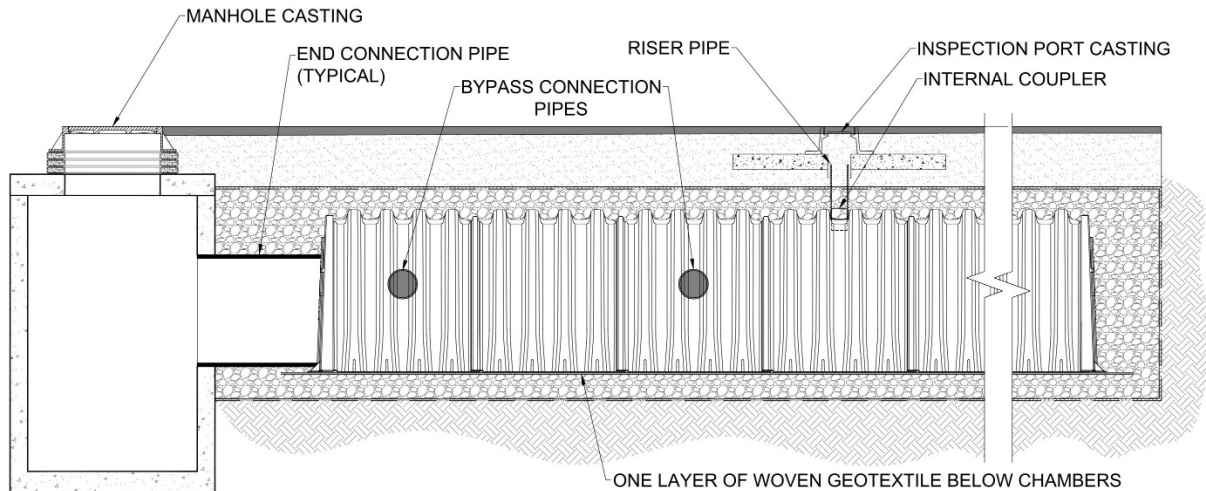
Main Header Row schematic showing inspection port, cross-connection pipes and woven geotextile
